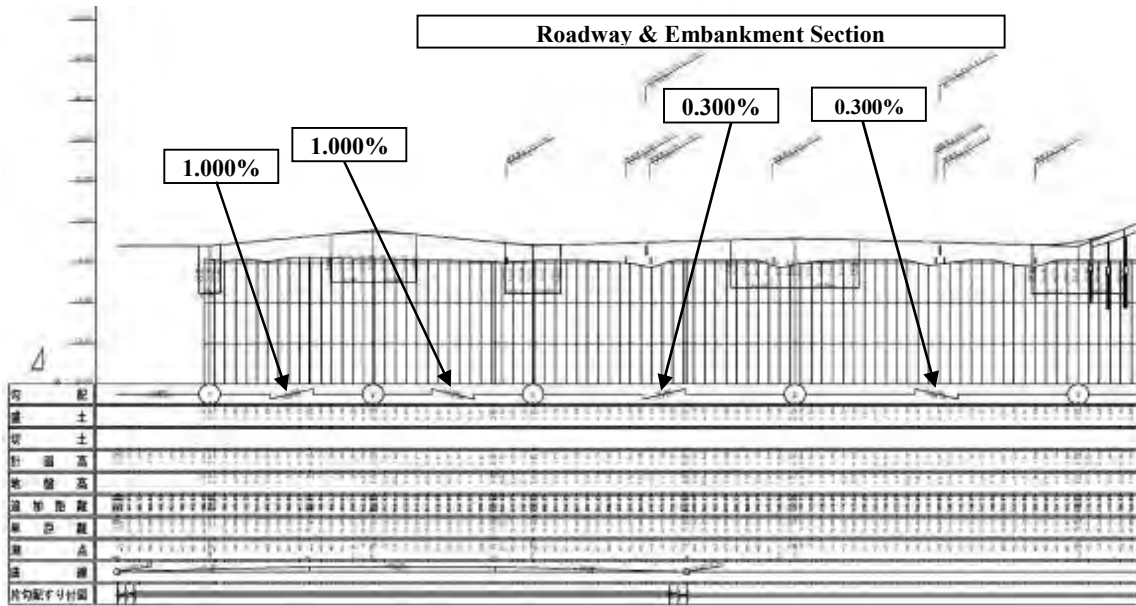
Vertical Slope & Cross-Section of Approach Road to Main Bridge on the Halong side
